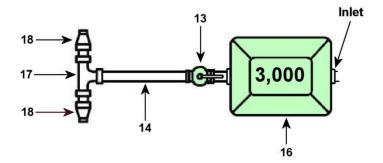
3,000-Gallon Tank Outlet Connections (Shower/Latrine).
